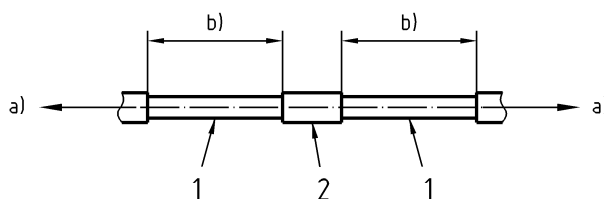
Arrangement of apparatus for testing sample under pull-out load
